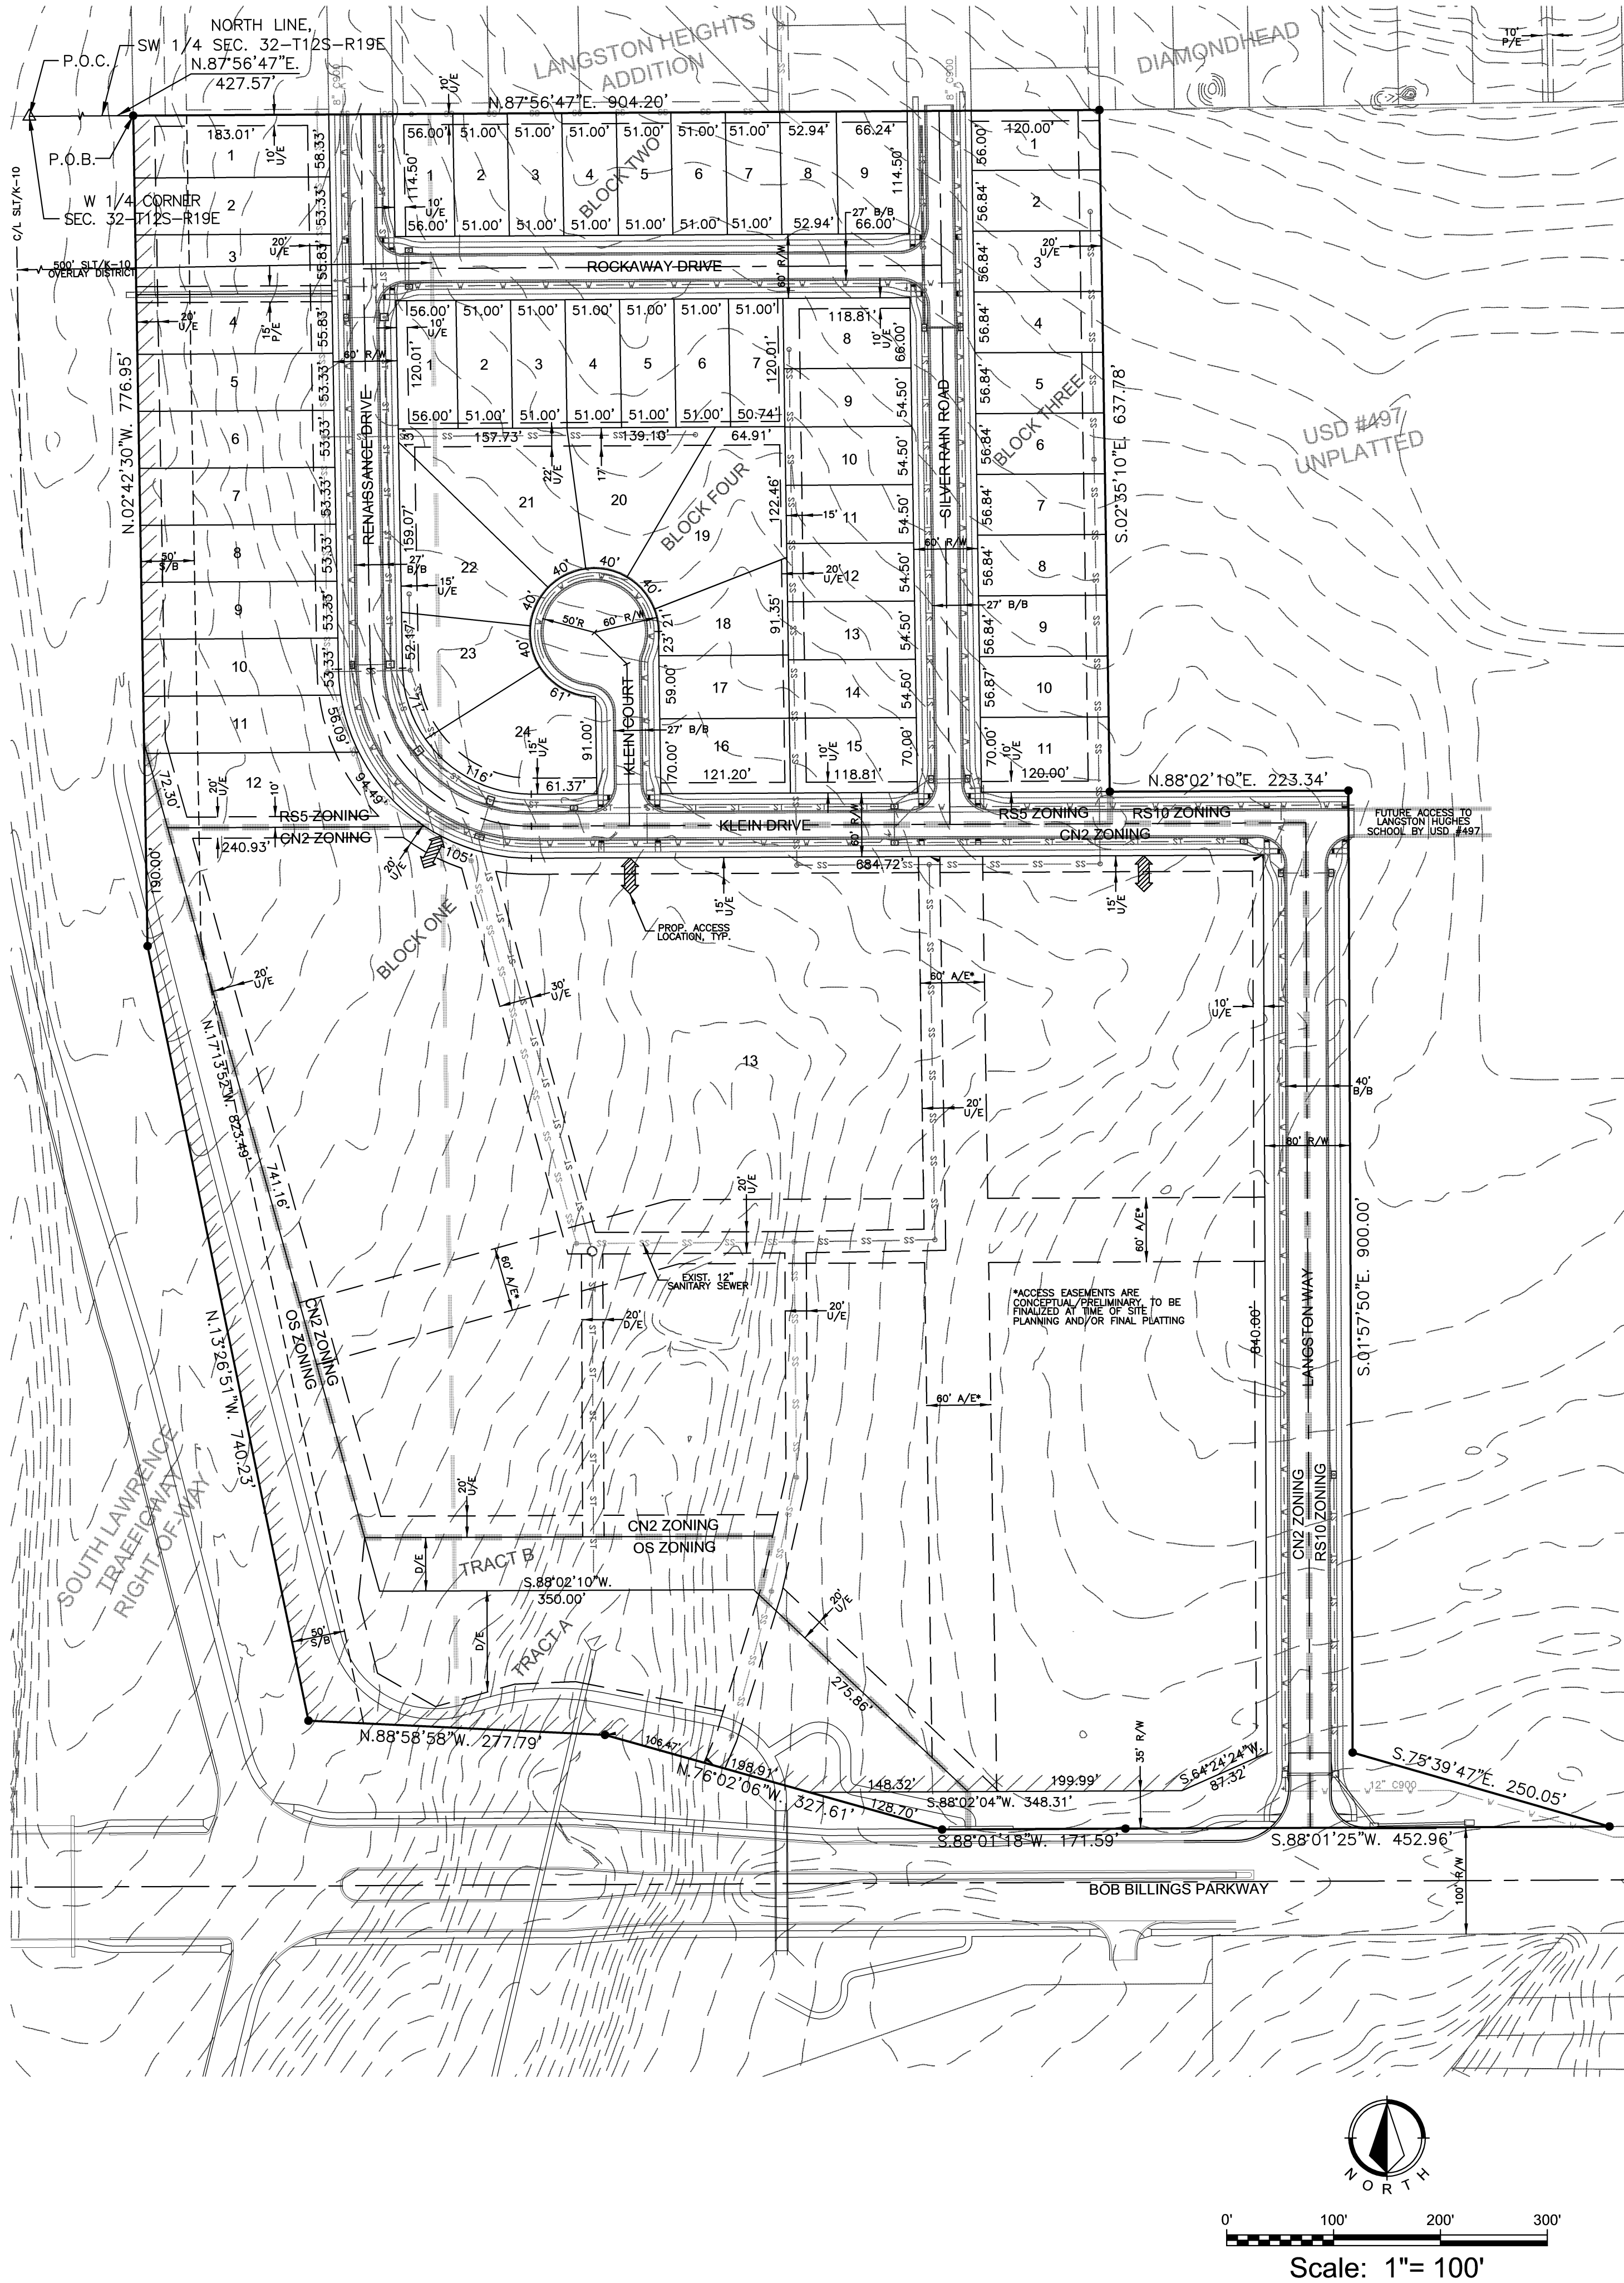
Existing and planned sidewalk connections for Langston Commons Subdivision and Langston Hughes Electuary School
